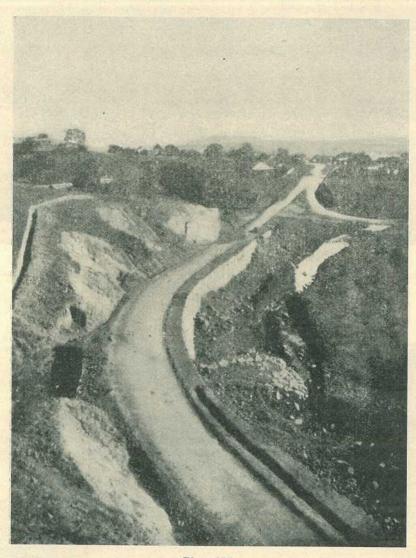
MOUNT MORGAN SHIRE.—Dawson Highway No. 25. New road near Mount Morgan under construction.
